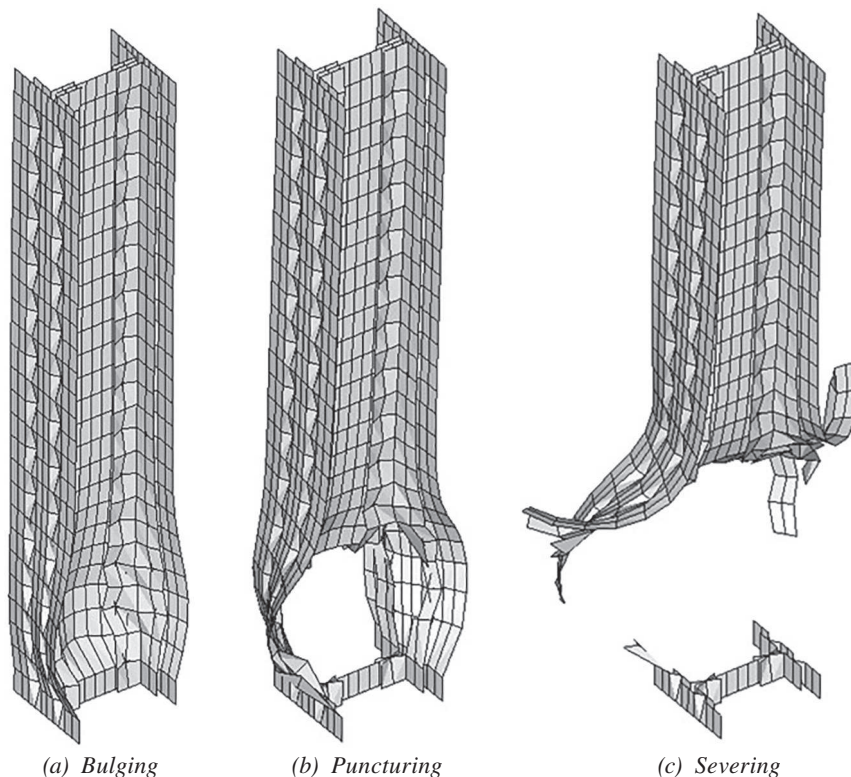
Typical deformation patterns or failure modes in close-in detonations for built-up wide flange steel columns equivalent to W14x176.
